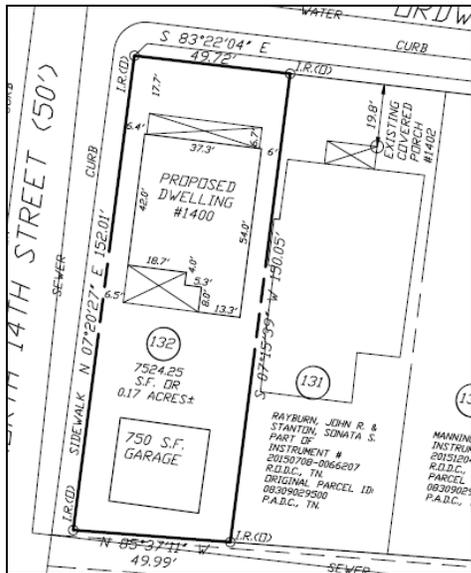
(left) is the proposed new site plan showing that 1402 Ordway is proposed to be less than five feet (5') from the side property line. Figure 3 shows the bay that will sit less than a foot (1') from the side property line.
